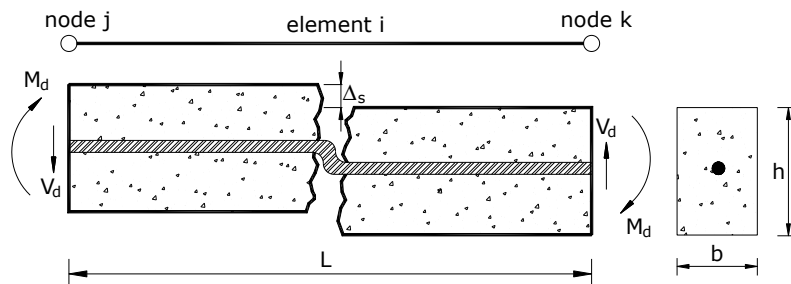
Dowel action mechanism along the cracked reinforced concrete member
